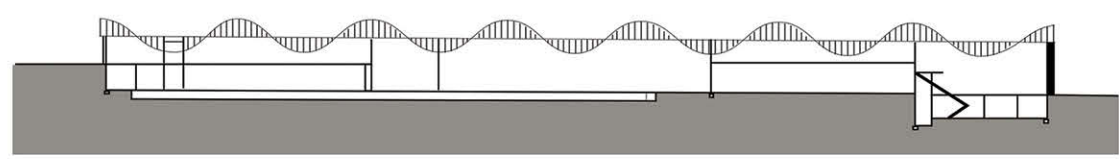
WINERY'S LONGITUDINAL SECTIONS, REFLECTING THE CONNECTION WITH THE TERRAIN
